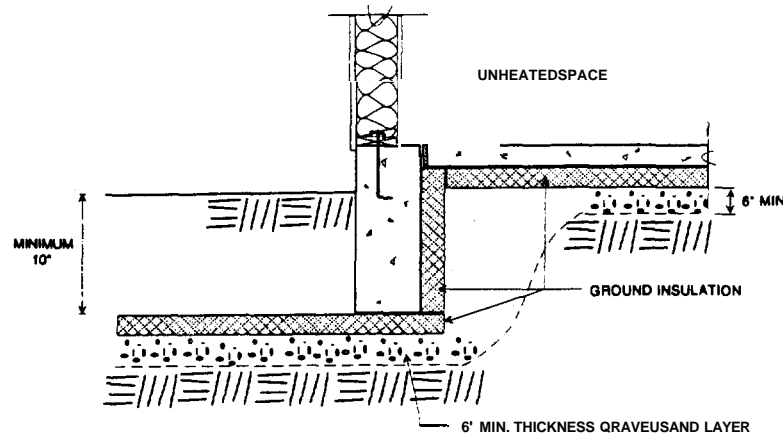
FPSF Design for Unheated Space with Independent Slab and Stem Wall.
